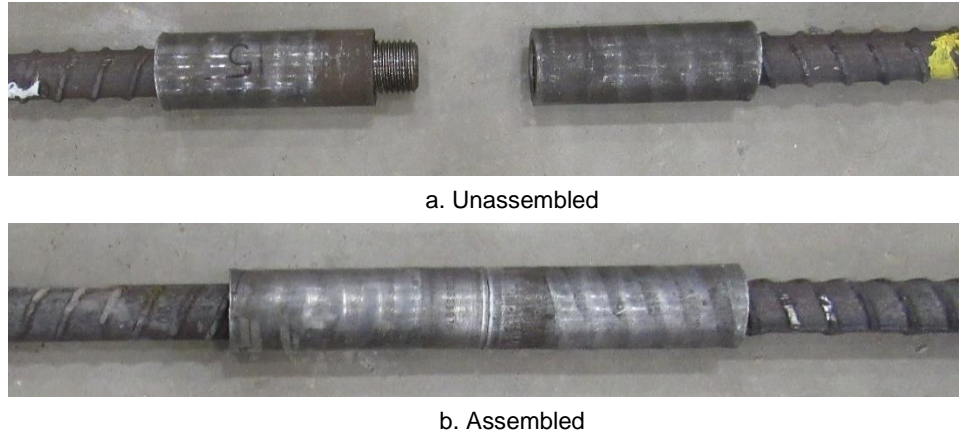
Sample preparation for hybrid coupler (swaged and threaded)
